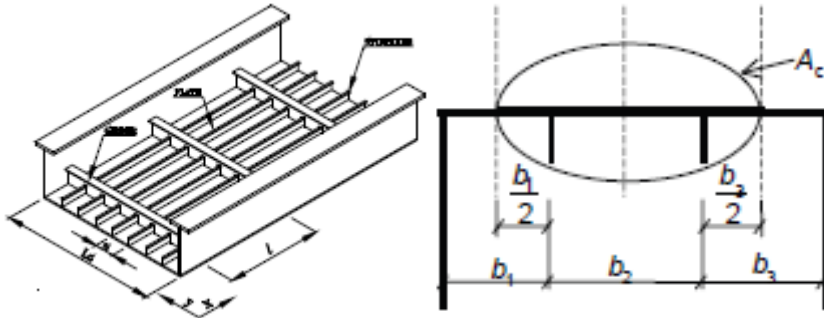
Stiffened plate considered to be between girders as presented in DNV (left) and in EC3 (right)
